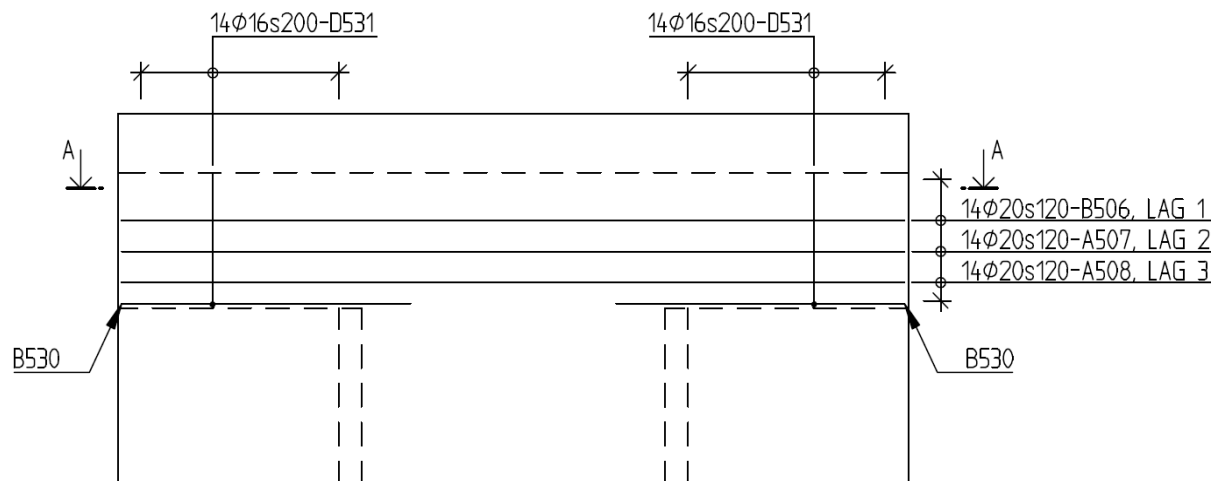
Plan of reinforcement arrangement in the FE-model, [mm].
